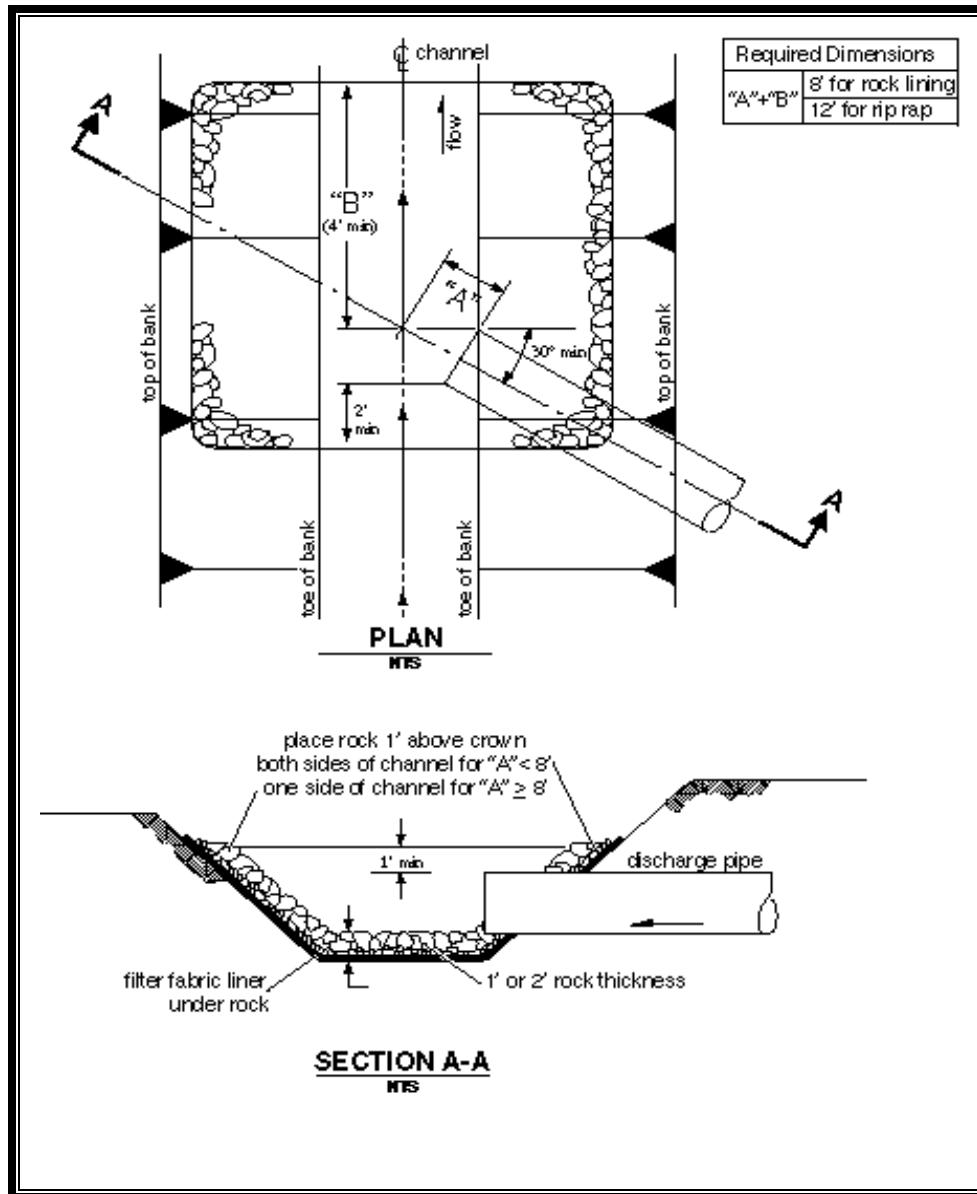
Pipe/Culvert Outfall Discharge Protection
